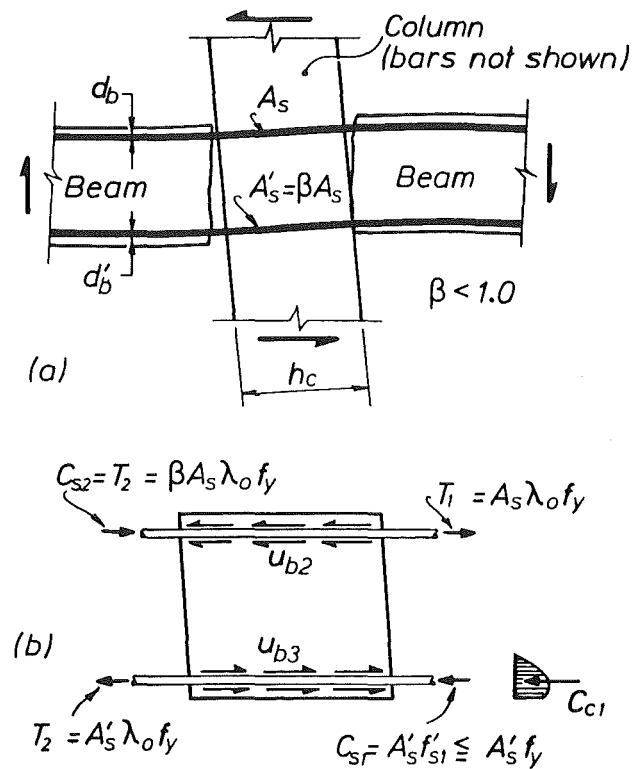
Actions and forces along beam bars at joint assembly with unsymmetrically reinforced beams
